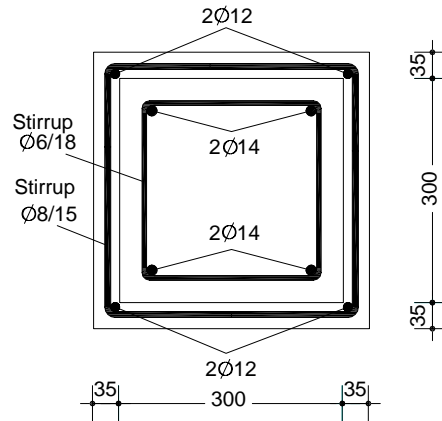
Dimensions of the cross-section and reinforcement layout of the RC columns strengthened by the FRCM jacket (dimensions in mm).
